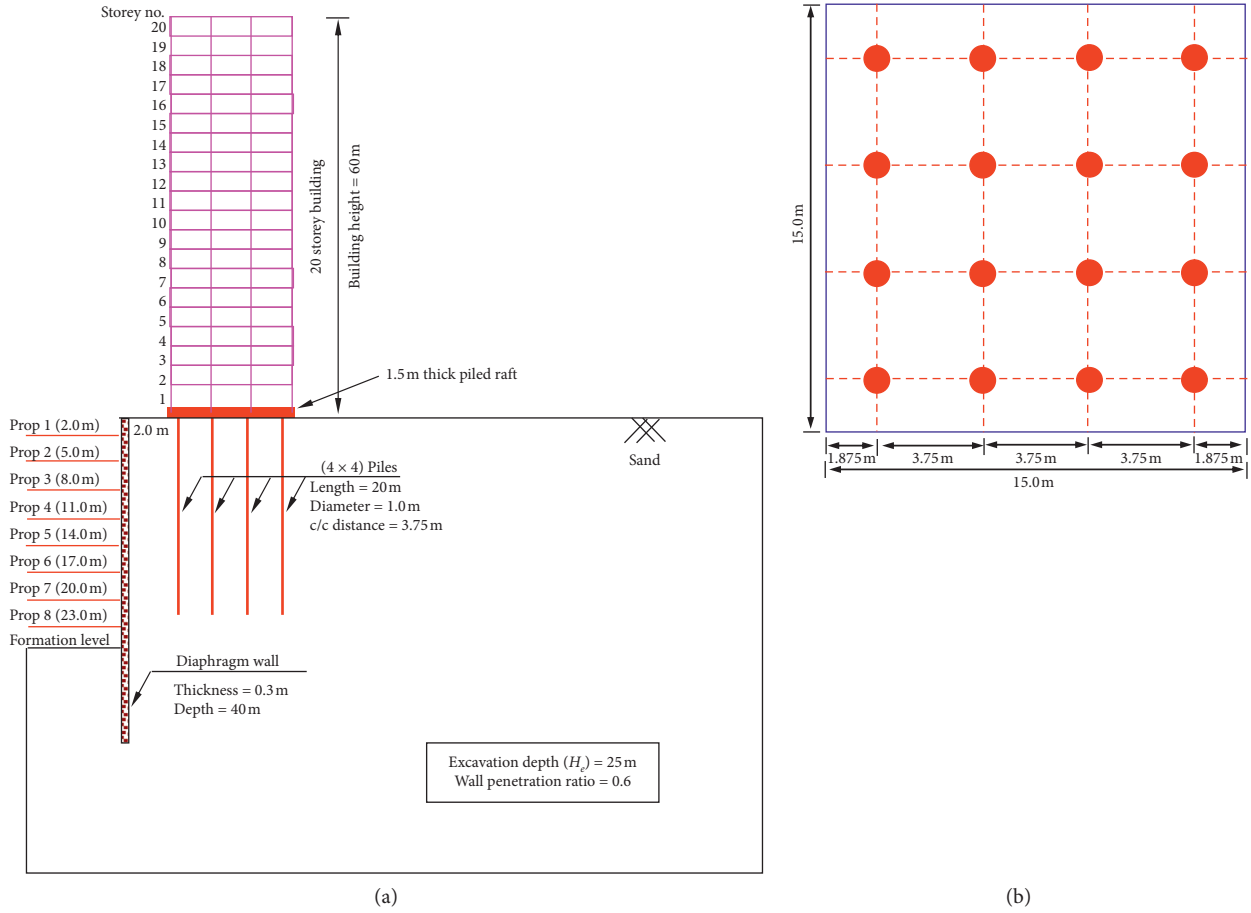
(a) General setup of building, piled raft, and excavation. (b) Piles arrangement in the raft.
